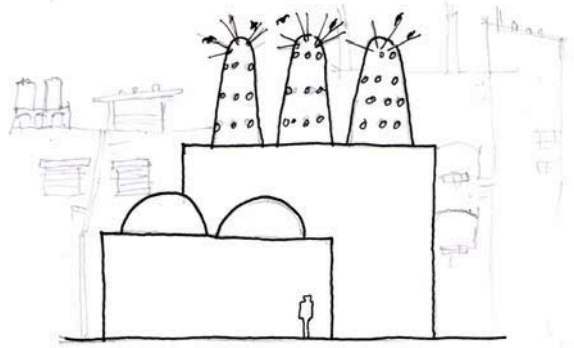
pigeon towers can be used to shelter animals and as an architectural element in the community centers. Some other ideas can be used in the same way for example: bee hives
